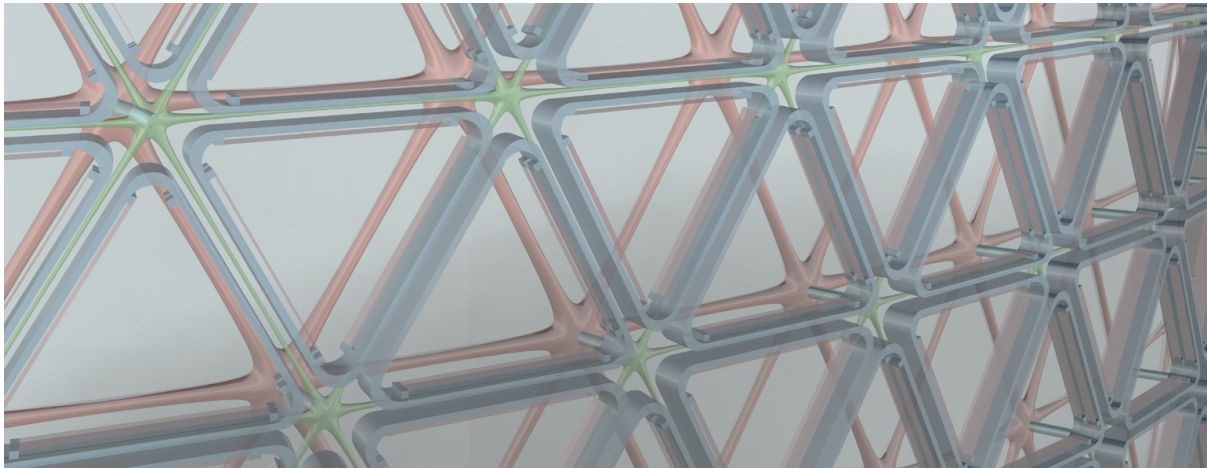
Aluminum Profile (Unit Frames & Rails) installed on TRIO 's facade.
